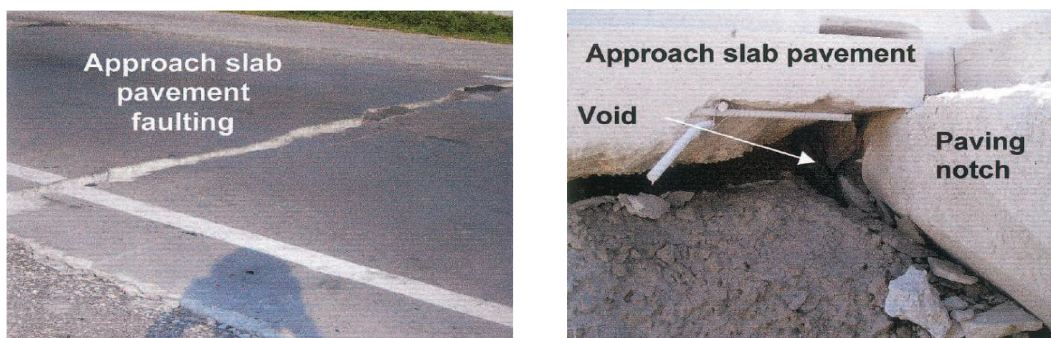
Failure at the run-on slab due to backfill settlement (White et al., 2010)
